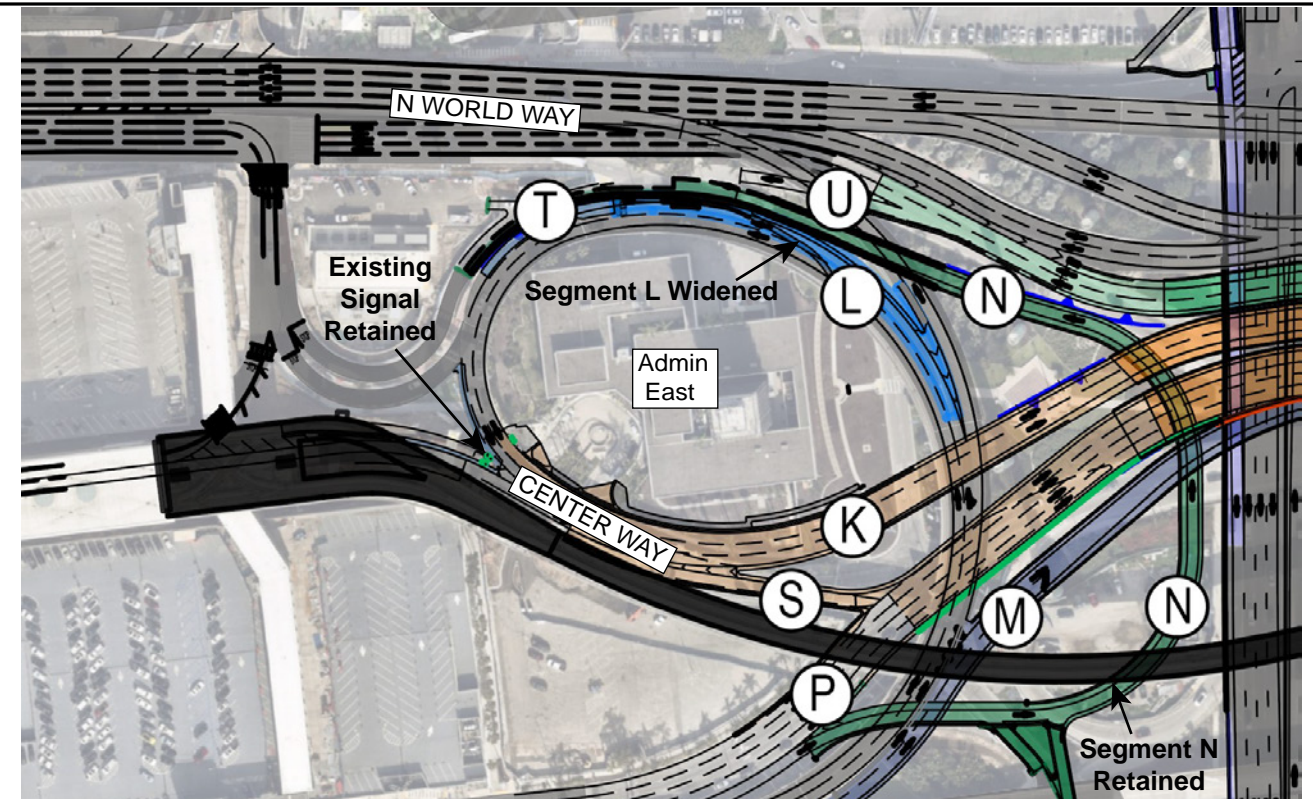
Instead of full replacement as contemplated in the Final EIR, the existing loop ramp bridge, designated Segment L, would be widened. Existing signal would be retained at Center Way for pedestrian access at Admin East. Instead of reconfiguring the airport return, the existing airport return, designated Segment N, would be retained.
